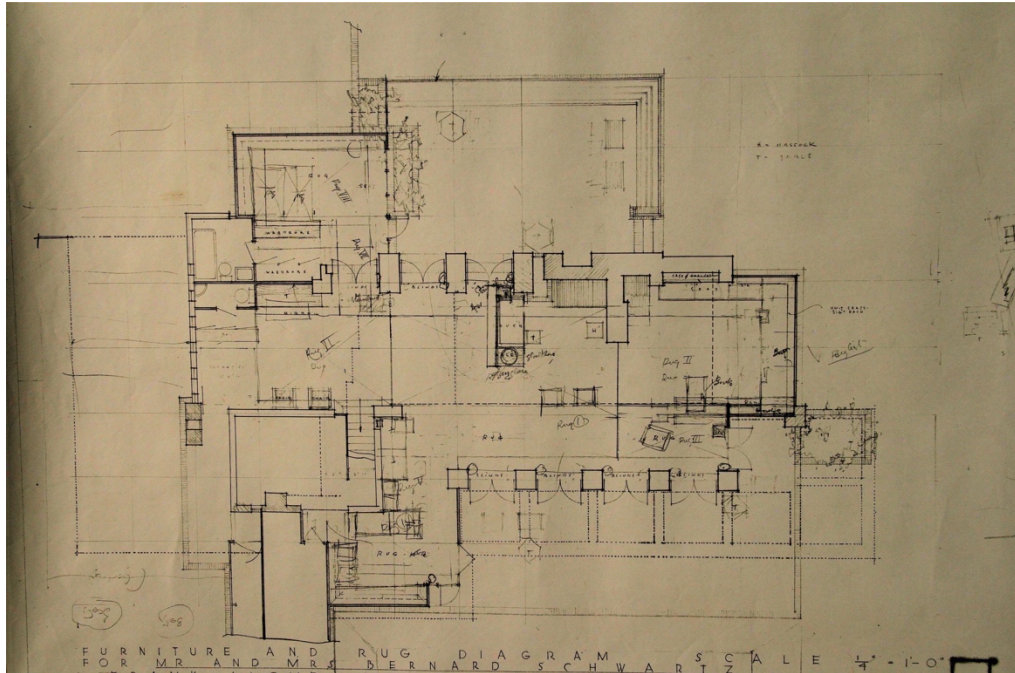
Schwartz floor plan with furniture layout shown (courtesy of Michael Ditmer).
